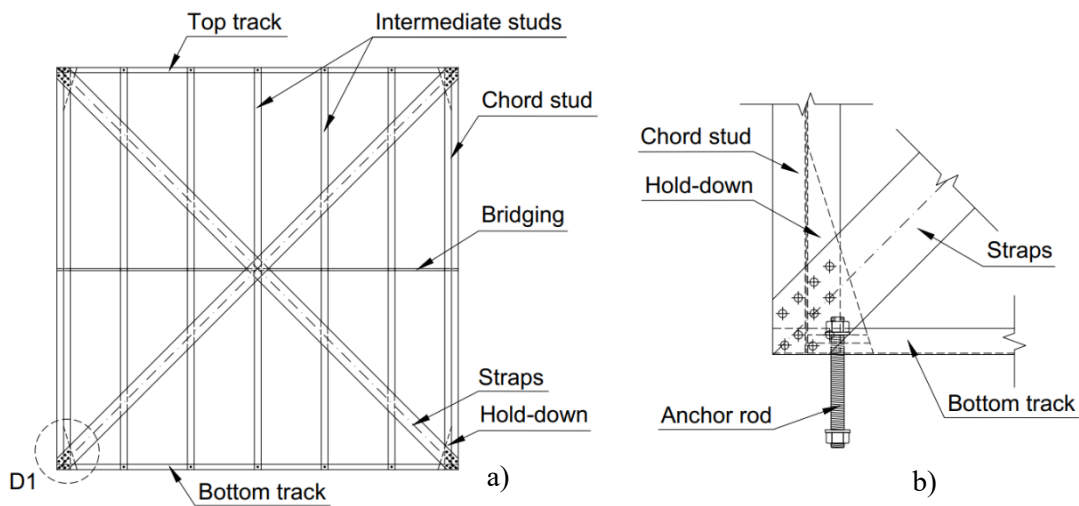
a) Typical screw connected strap-braced wall configuration, b) Detail D1, of the wall's anchoring system
